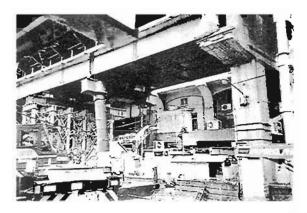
Railway near Centre of Kobe -Damage to Steel Portal Pier centrifugally cast columns lacked ductility
